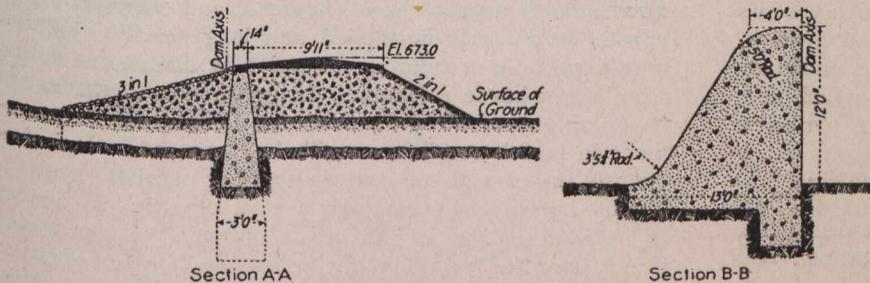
Sections of Sooke Lake Dam and Earthfill.
